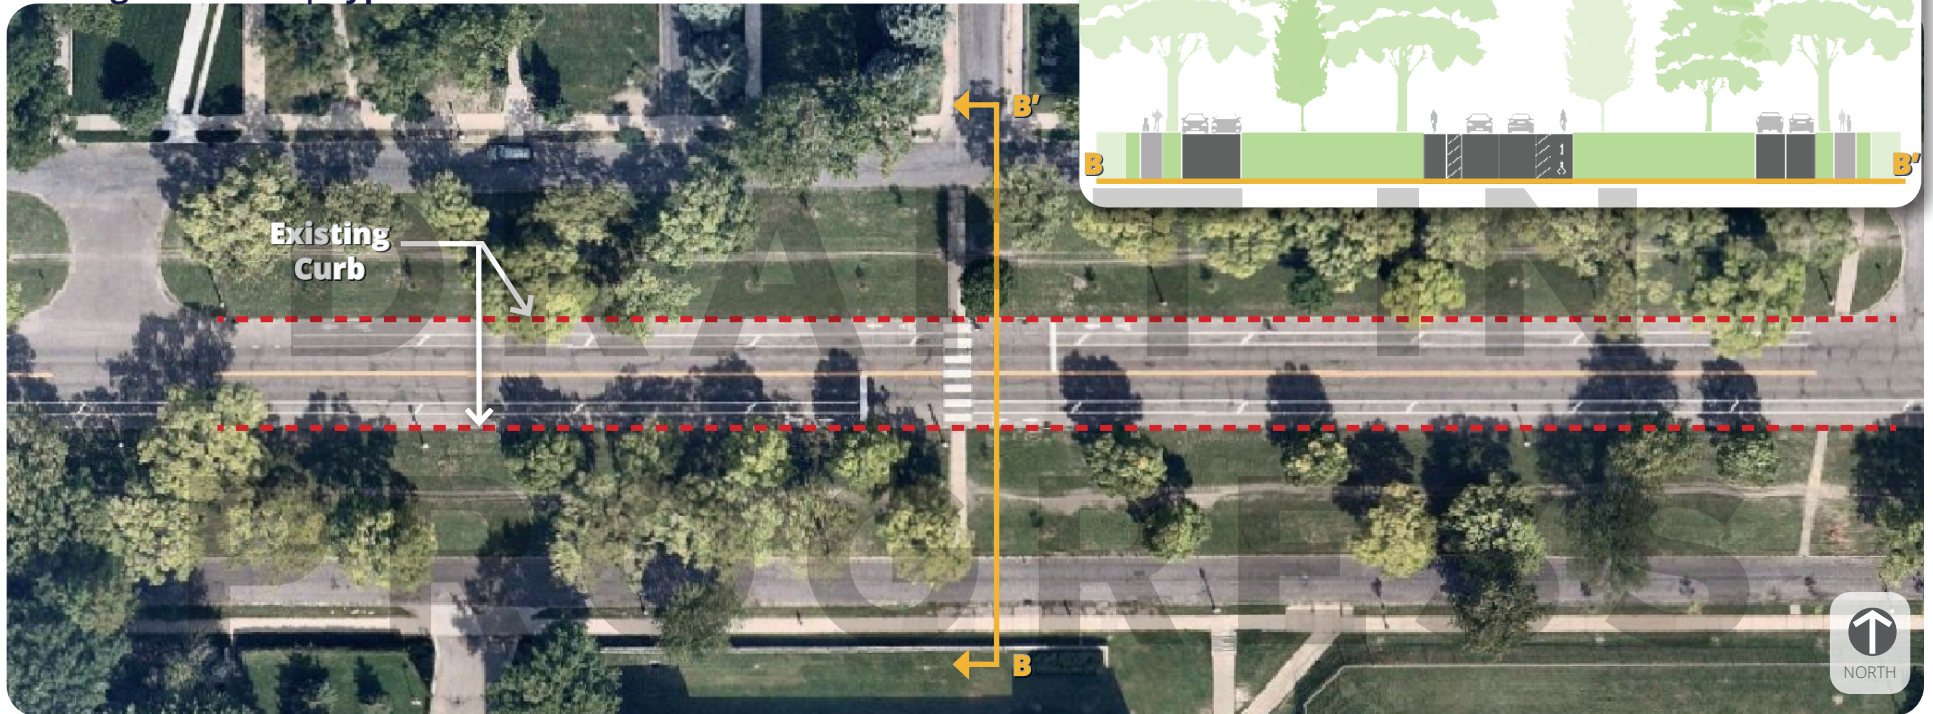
| Segment B - Existing Condition - Typical Block
